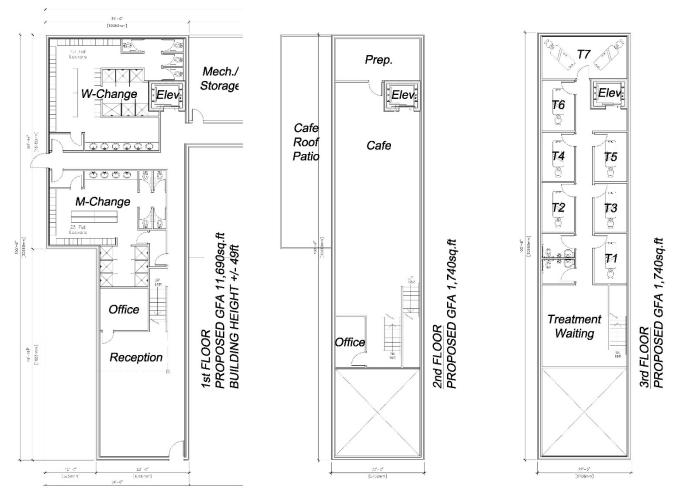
First Floor Plan (left), second floor plan (middle), and third floor plan (right), Inn and Spa Building (Source: BPE Developments)
